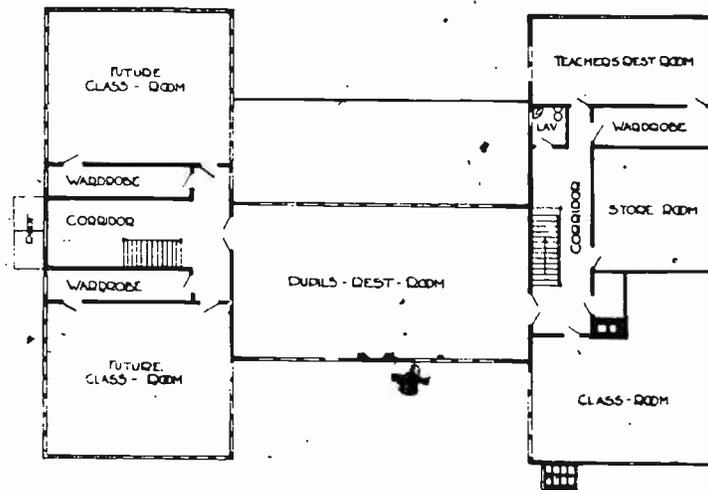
Second-floor plans, Edward Mott Moore Open-air School.
